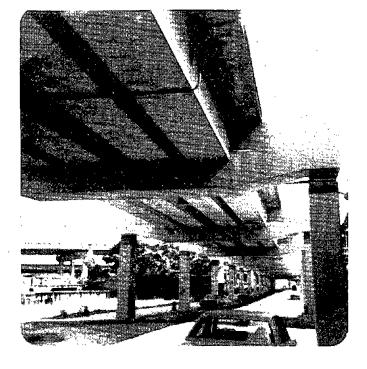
SEPTA FRANKFORD LINE CONCRETE VIADUCT
